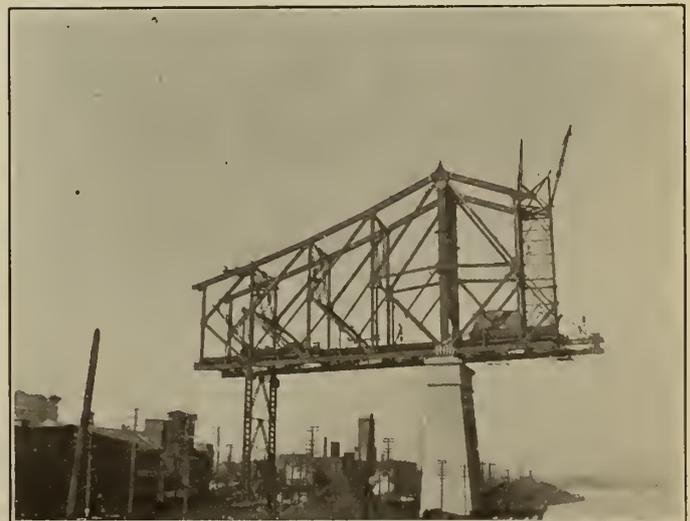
Main Span, North Side—Erection proceeding on Cantilever Arm. Traveller No. 3 being set up on Anchor Arm.
